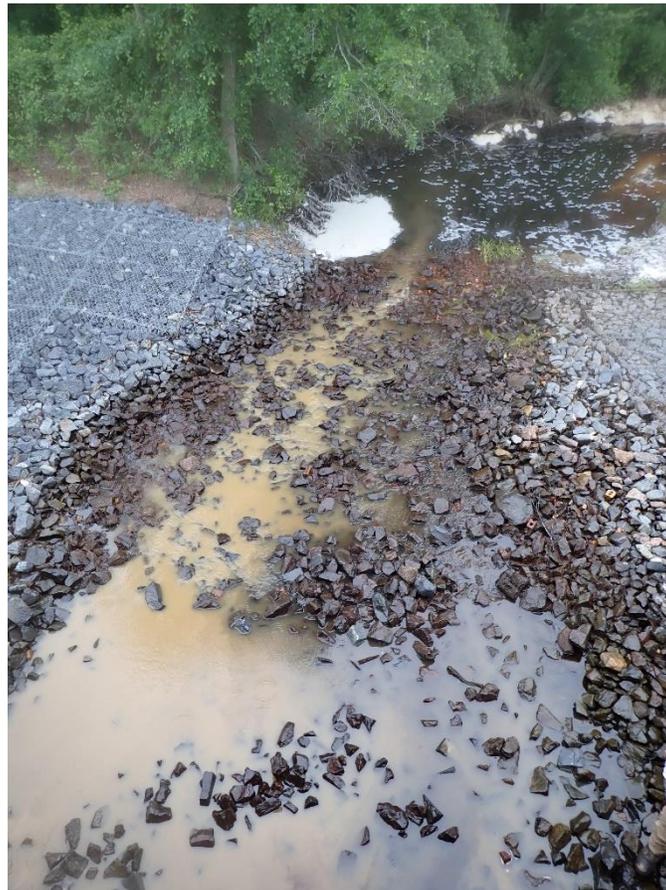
General view of downstream end after inspection activities. Note the widespread silt.
